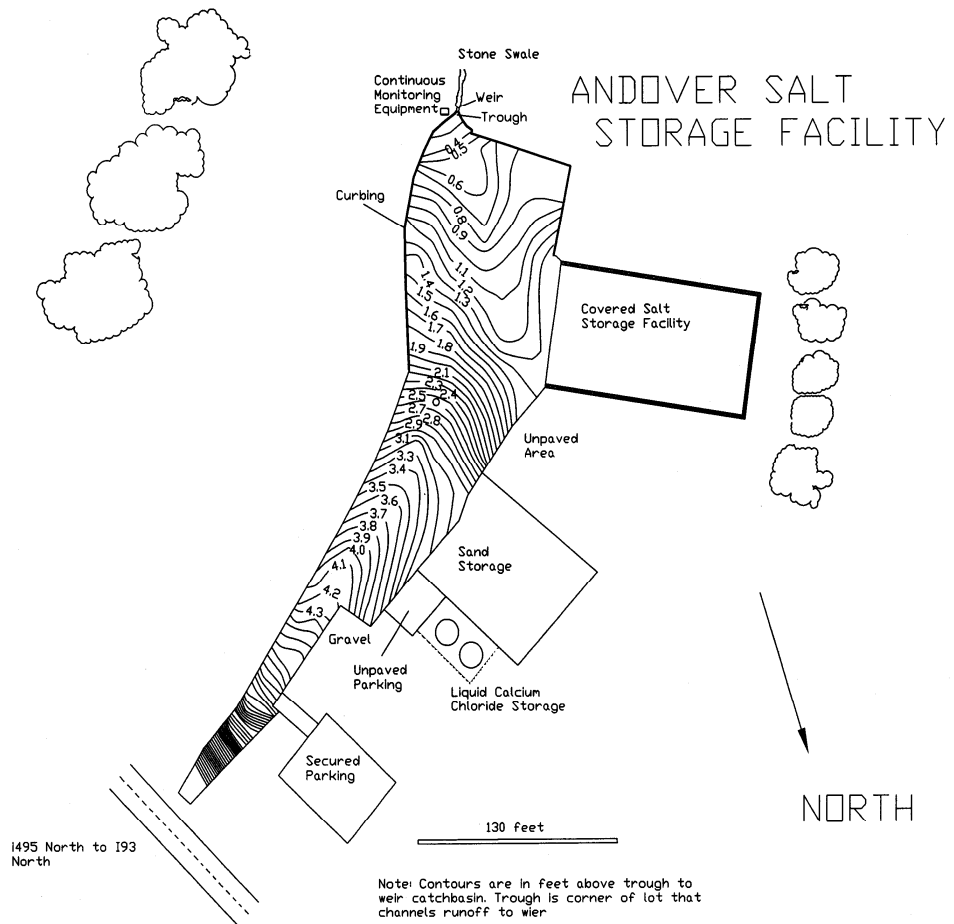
Paved Runoff Area of Andover Salt Storage Facility
